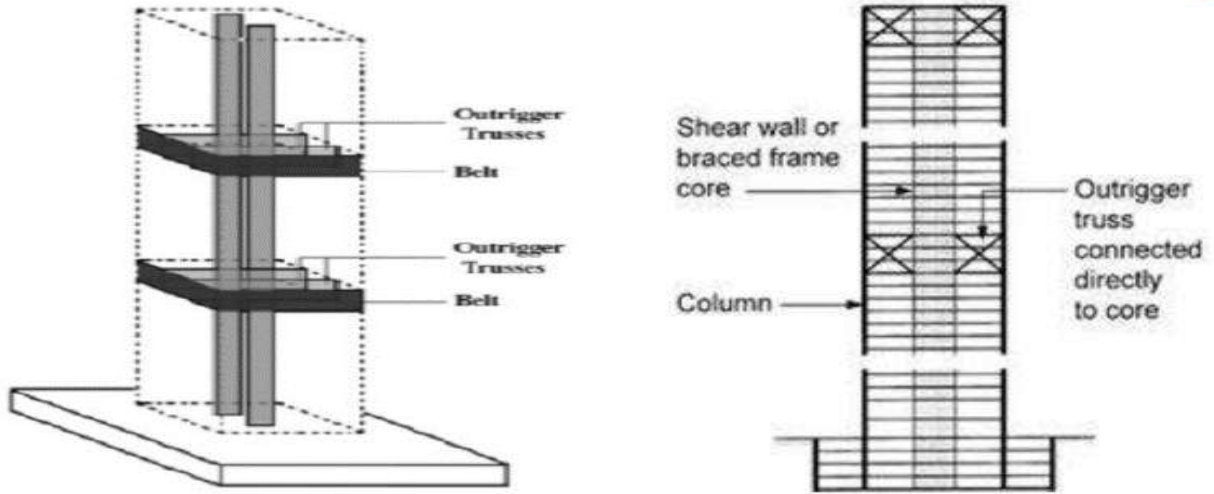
Belt Truss outrigger System (Source : Journal of Structural Integrity and Maintenance)
